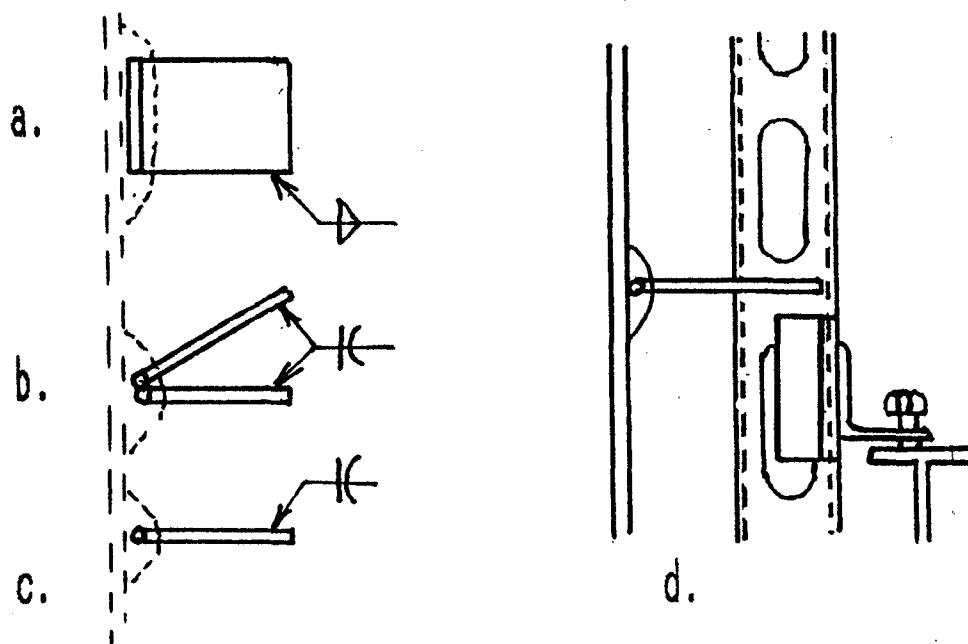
Glass fiber reinforced concrete (from McCann [1991]).
